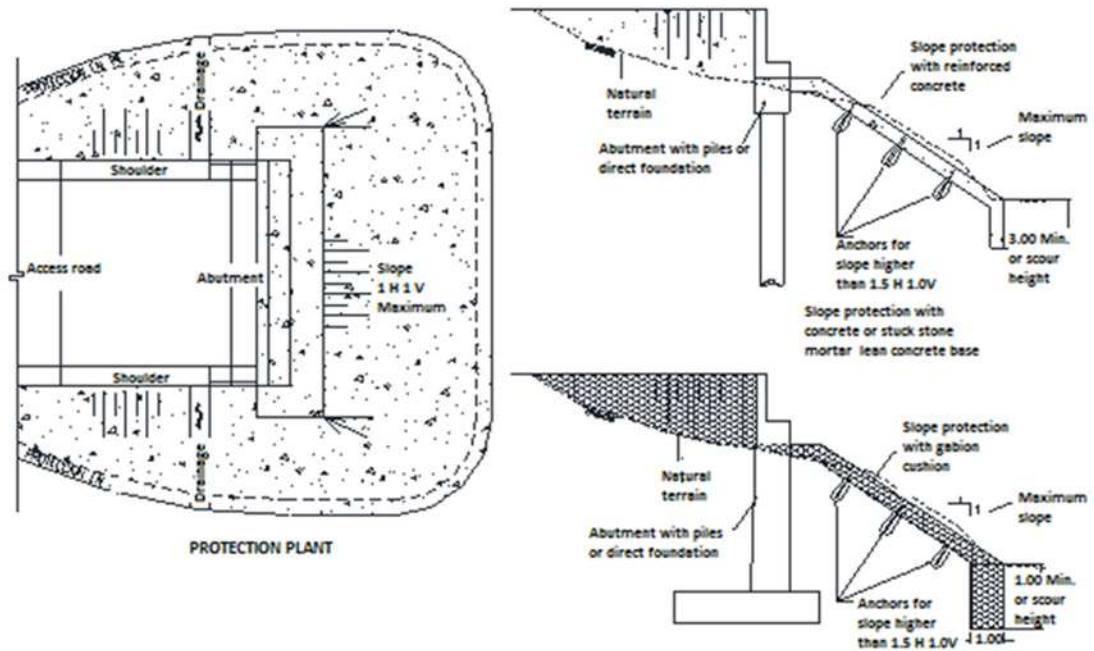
Protection abutments without walls on the banks of the river, with anchors. (SPOP, 2014)
